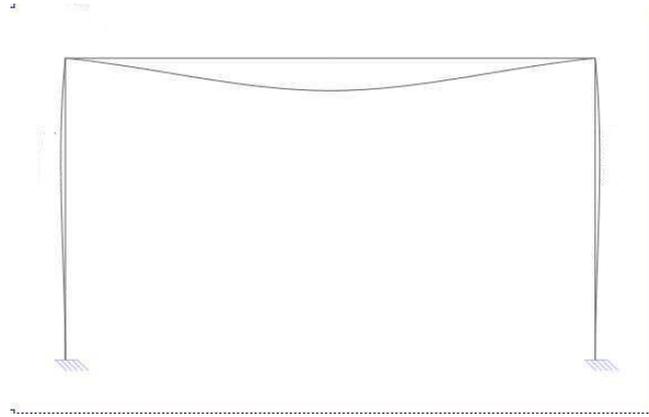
B-WIM instrumented frame bridge on the RN19 near Nogent-sur-Seine
